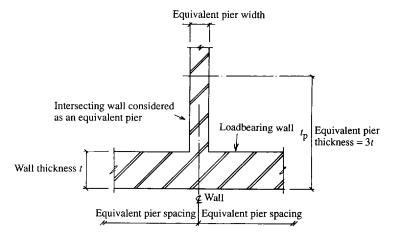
Plan on an intersecting wall considered as an equivalent pier
